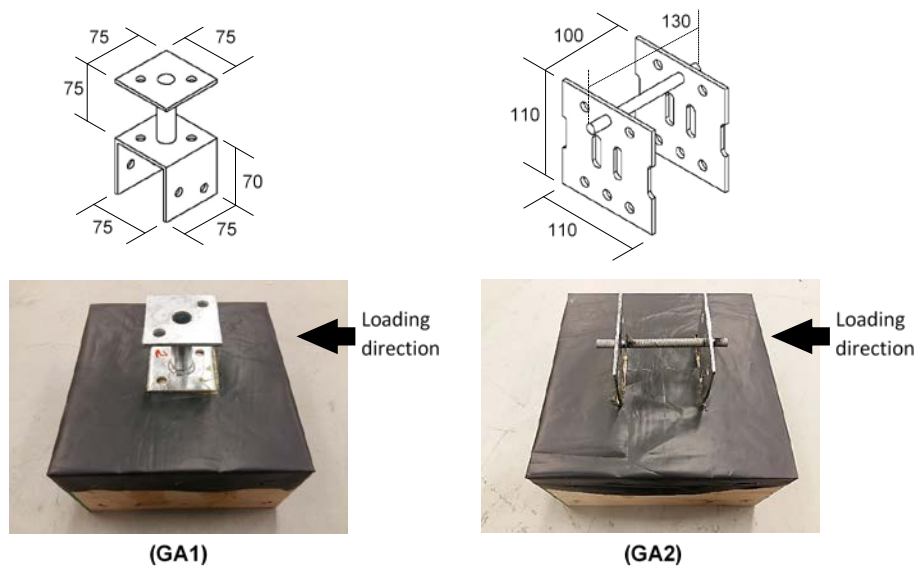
Configurations of the glued-in connections (measurements in mm); timber post anchor (GA1); steel plates with reinforcing bar (GA2).
